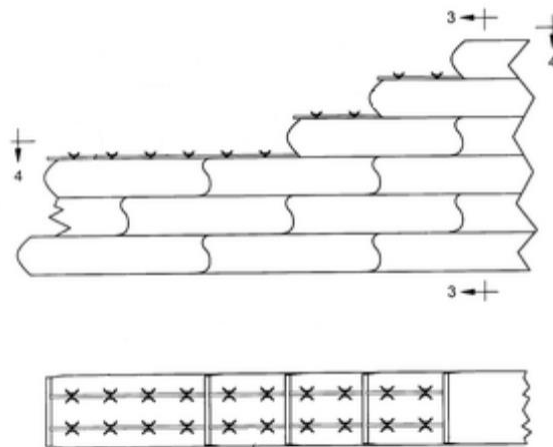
Elevation and plan view of earthbag layers. Source: Khalili (1999)
